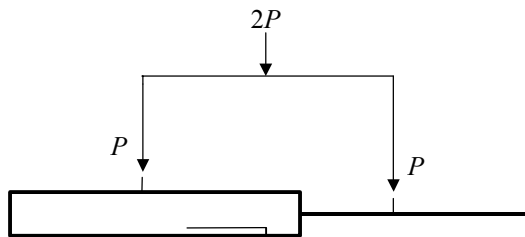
External loading beam: by applying a deformation in the centre, equal forces P were obtained at the lattice girder structure.
